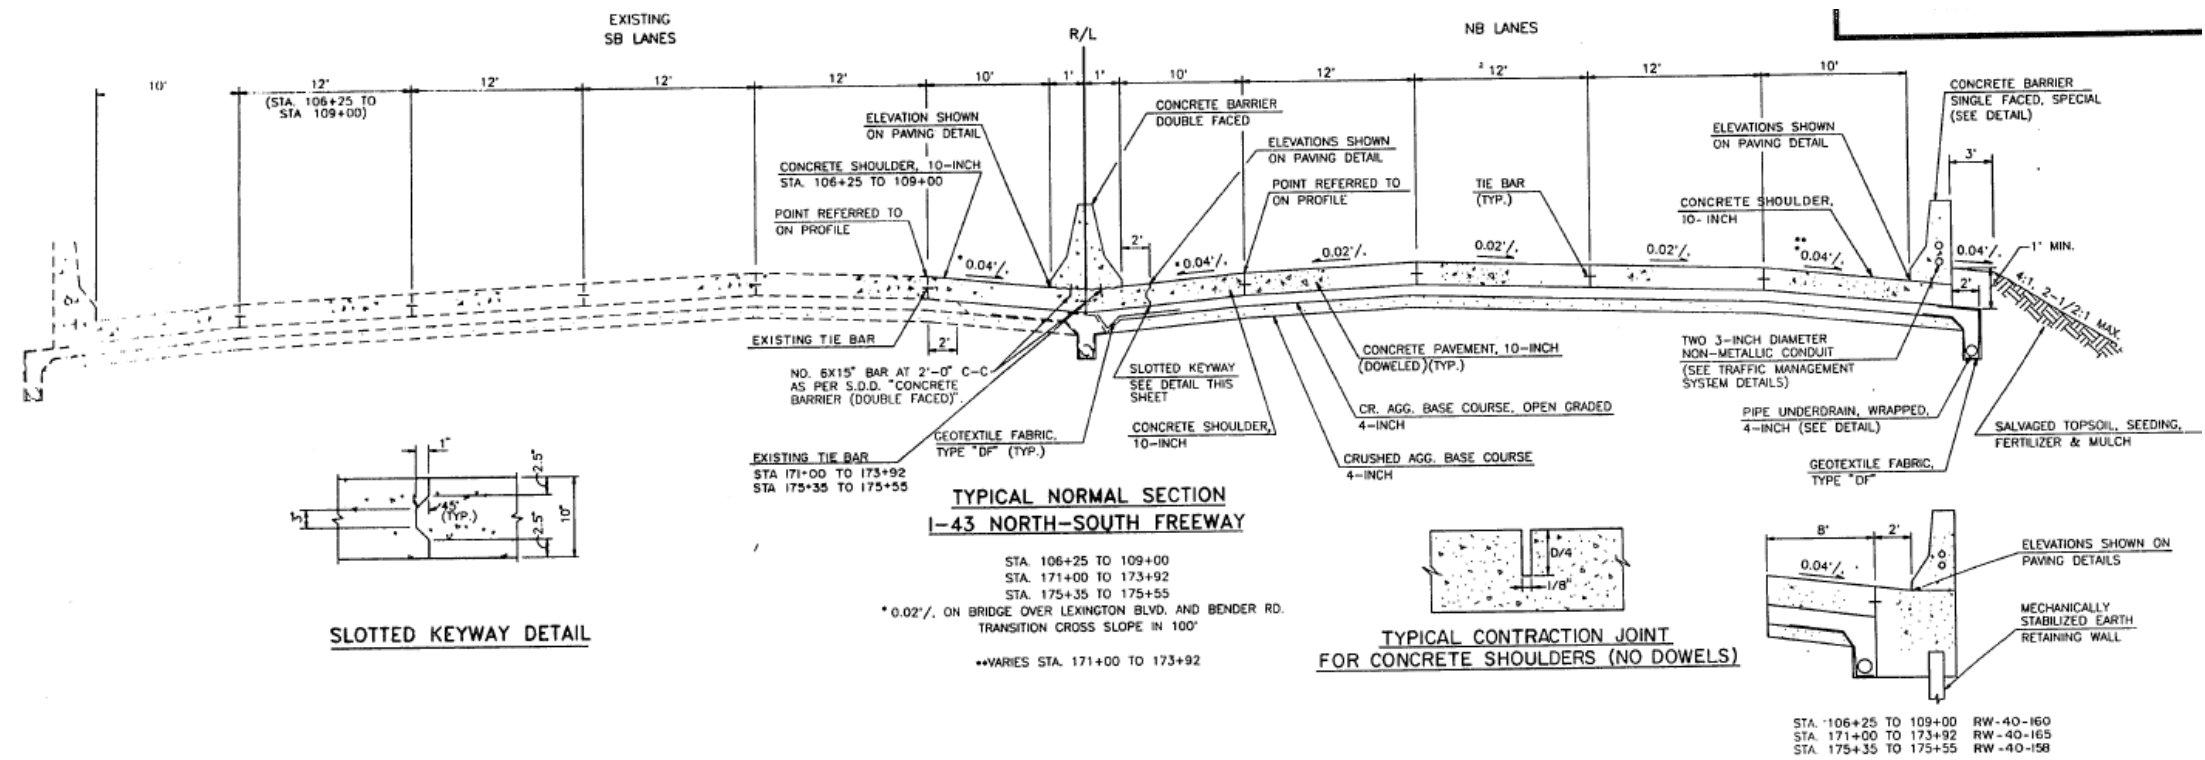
Typical section of the I-43 highway at the bridge approach slab between stations 175+35 and 175+55.
